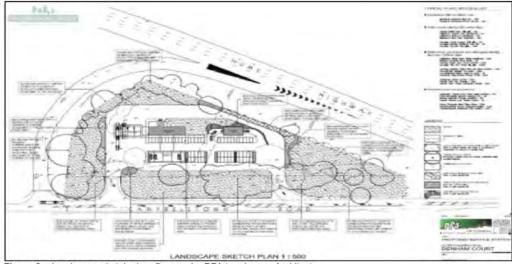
Landscape sketch plan. Source- by RFA Landscape Architects
